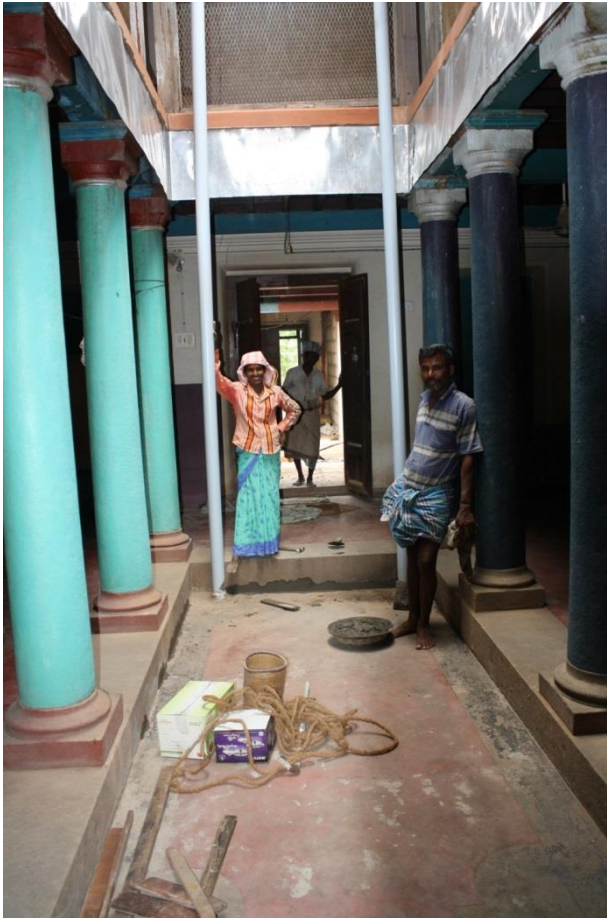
New Pipes for collecting water in a Chettiar house in Kothari (photo by M.SINOU)
